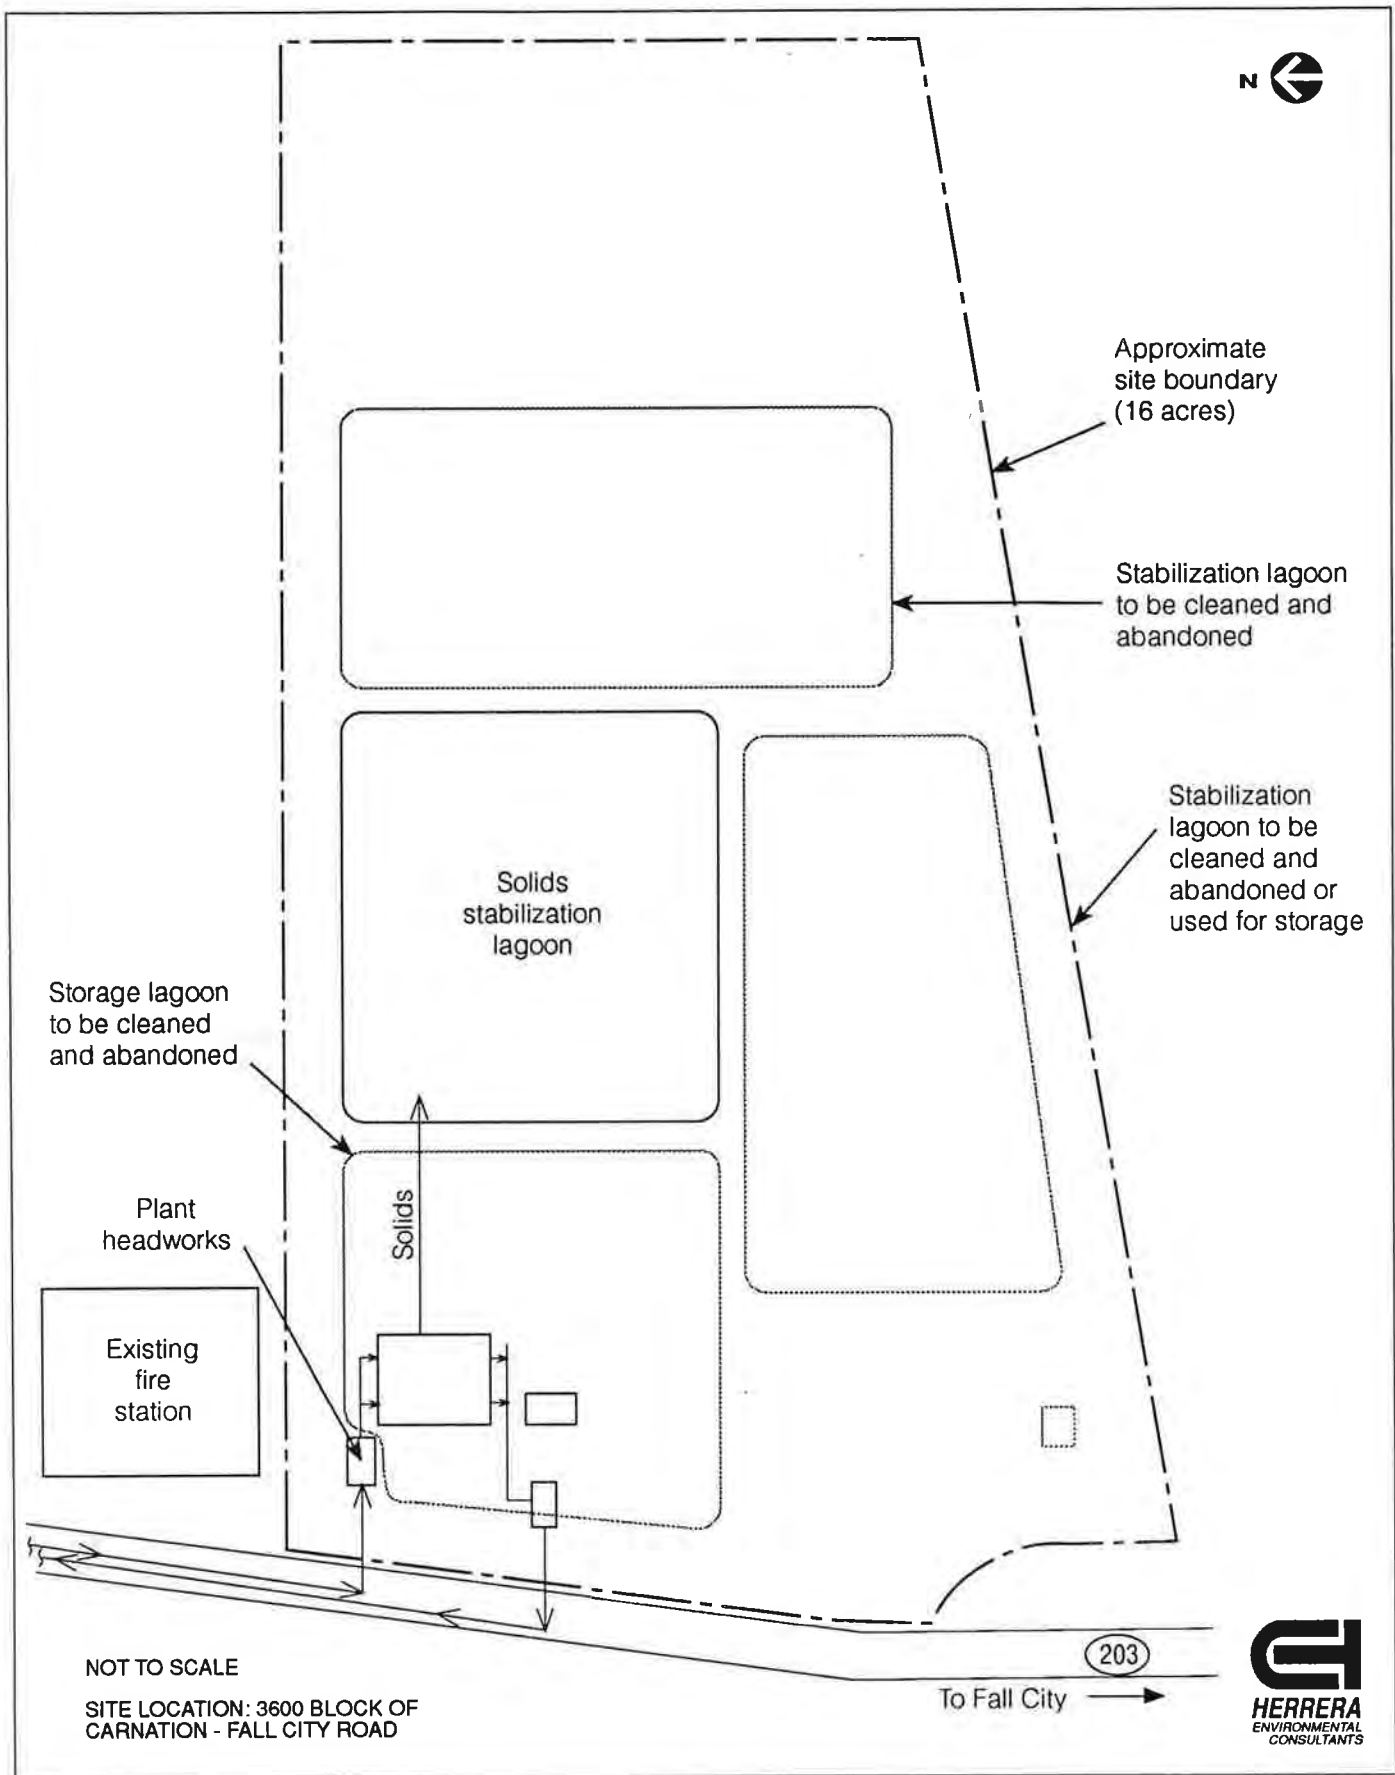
Conceptual layout of 0.3 MGD treatment facility for alternative 1.
